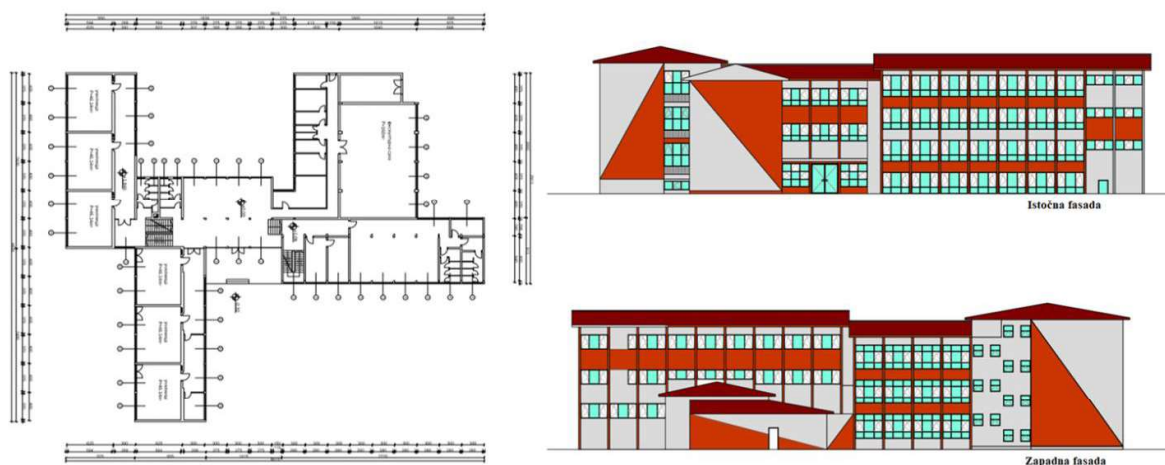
Draft: Ground floor and the elevations of the building "Hasan Prishtina" in Čair-Skopje Municipality, digitized existing project documentation
